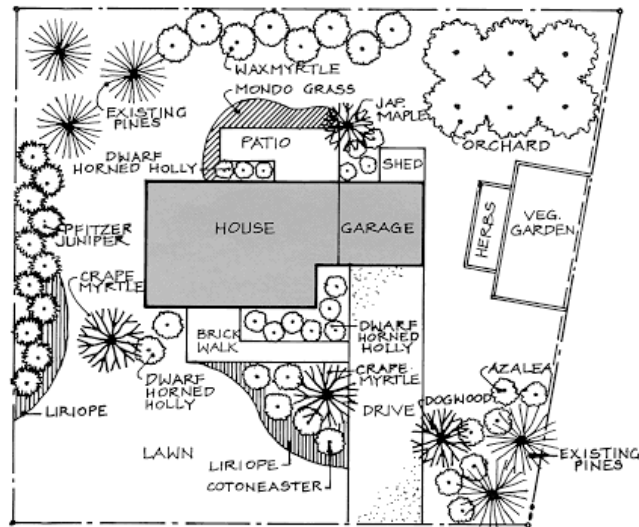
The final planting and construction plan. Plants used are listed on the following page.
